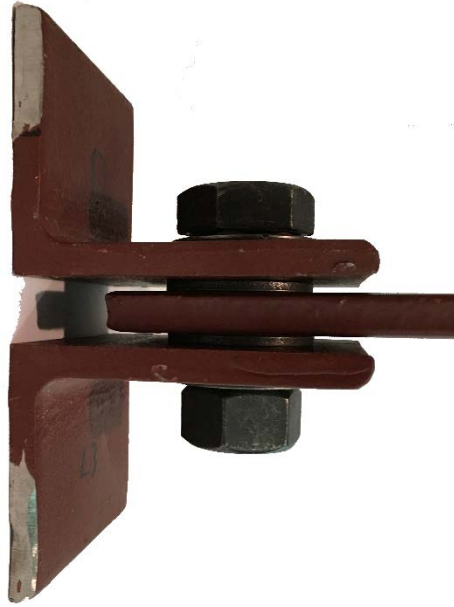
Hardened Structural Washers sandwiched between Steel Angles and Strut
